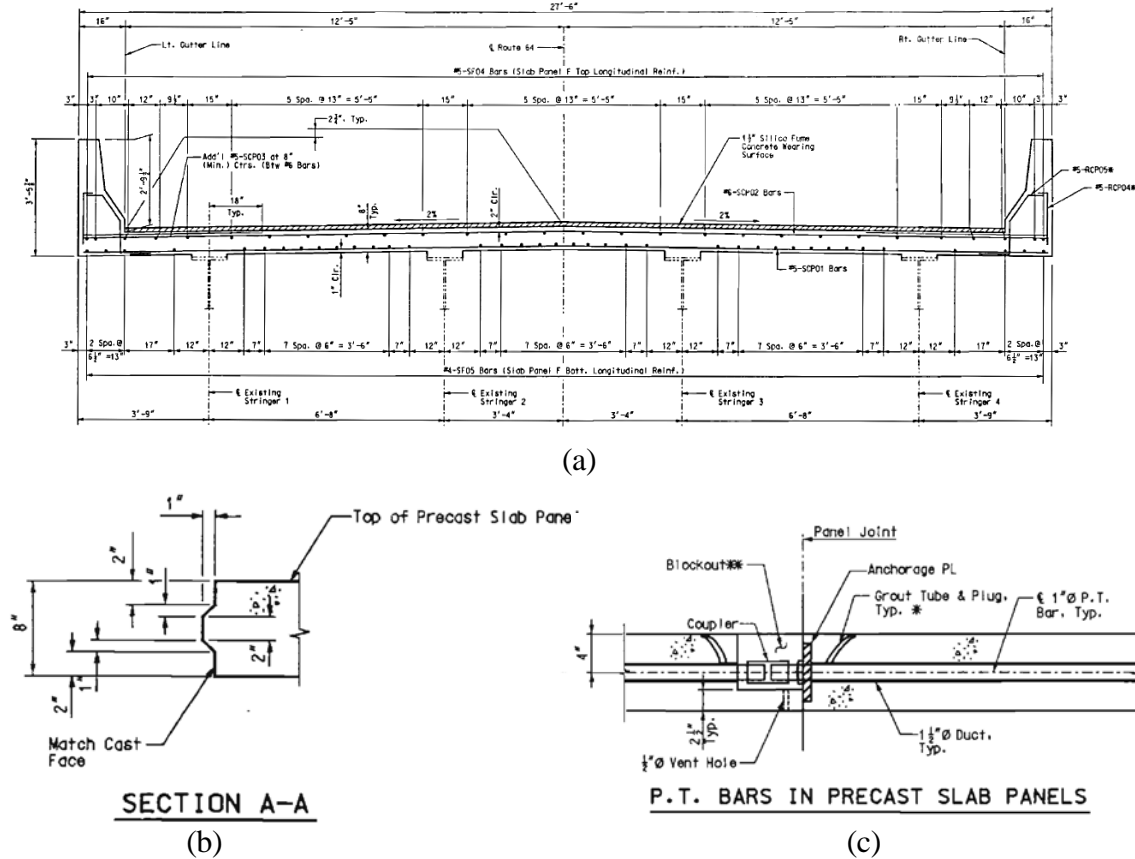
Typical FDPC deck panel detail for Missouri: (a) typical deck panel section, (b) male-to-female connection detail, and (c) post-tensioned bars in precast slab panels[5]
